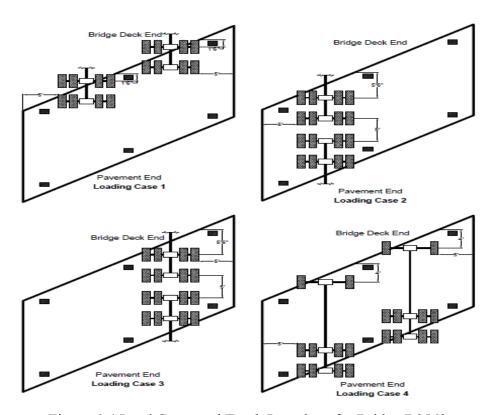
Load Cases and Truck Locations for Bridge B0563
